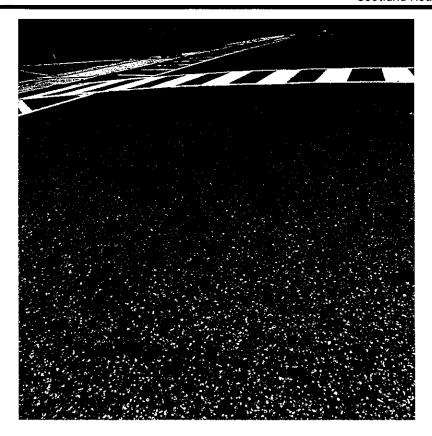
Viewing northeast on Heywood Avenue towards Berkeley Avenue
